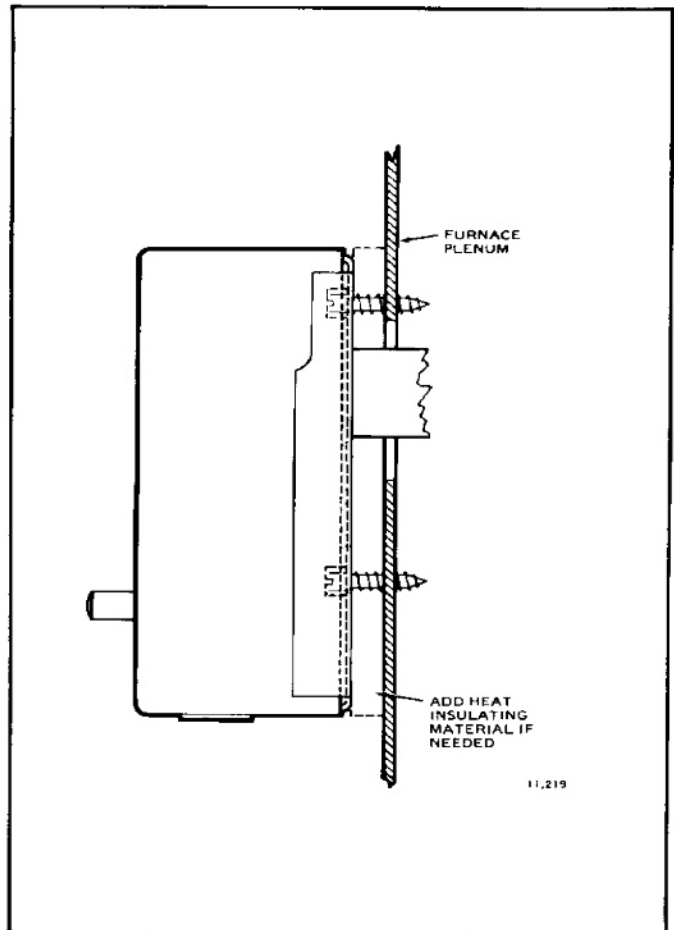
SURFACE MOUNTING FOR L4064. THE L4064C AND D REQUIRE A 1-1/2 in. [38.1 mm] HOLE FOR ELEMENT INSERTION; ALL OTHER MODELS REQUIRE A 13/16 in. [20.6 mm] HOLE.
